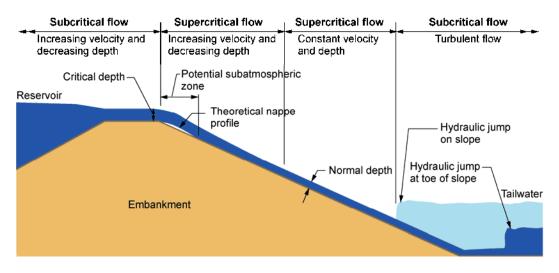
Typical hydraulic conditions during embankment overtopping (Reclamation).
